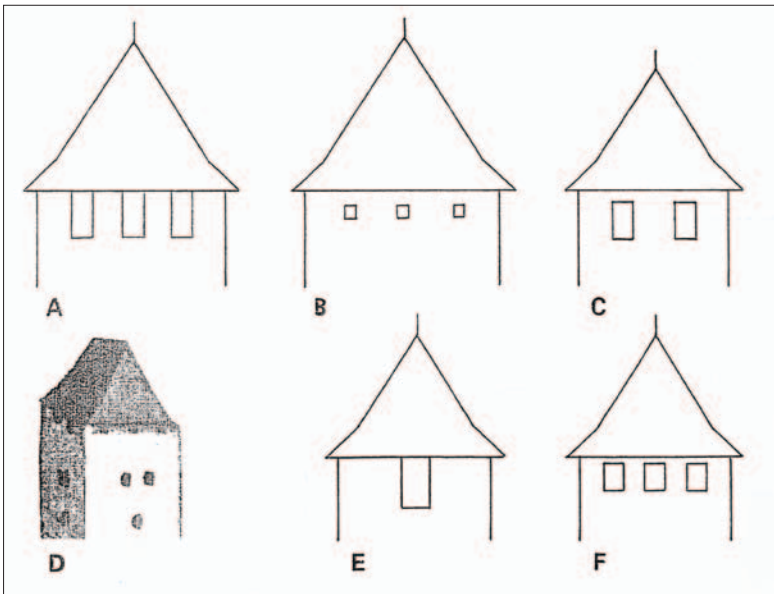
An account of the tops of defense towers: A – Bosiljevo, B – Brinje, C – Dvigrad, D – Cirkvena, E – Ozalj, F – Stupčanica (drawing by: Z. Horvat)
